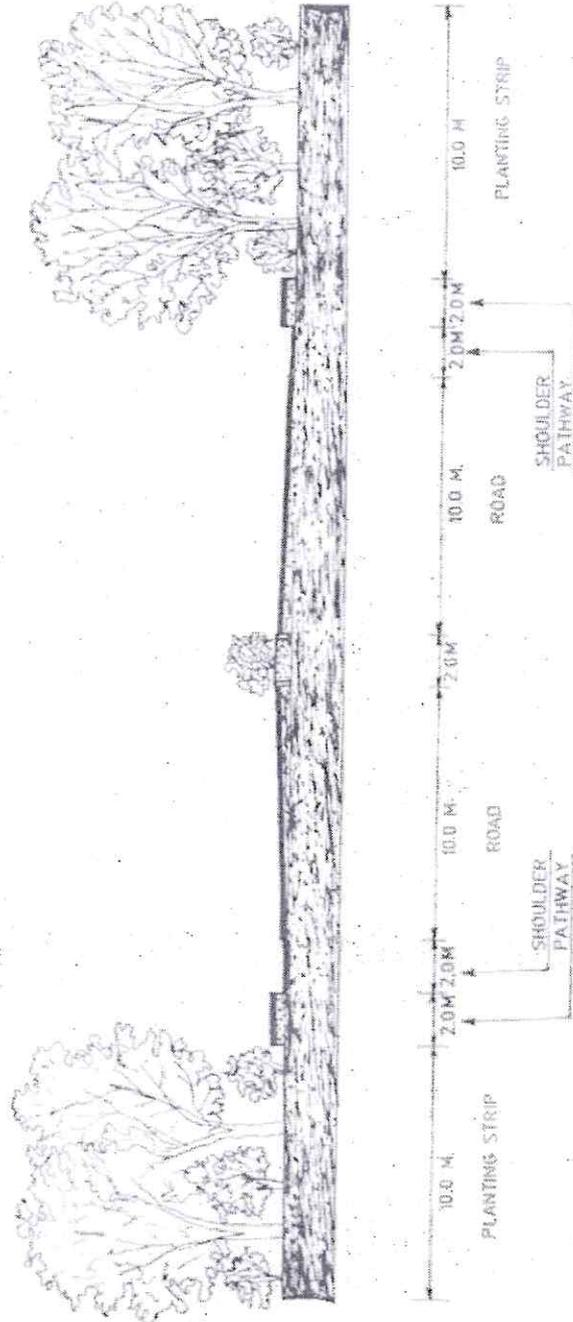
TYPICAL ROAD-SIDE PLANTATION
